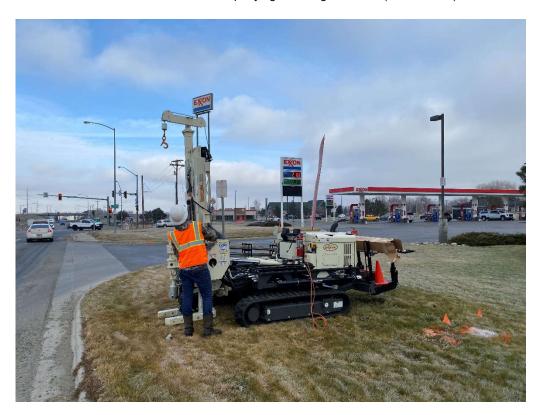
West of Casey's looking north (SB19 – SB20).
